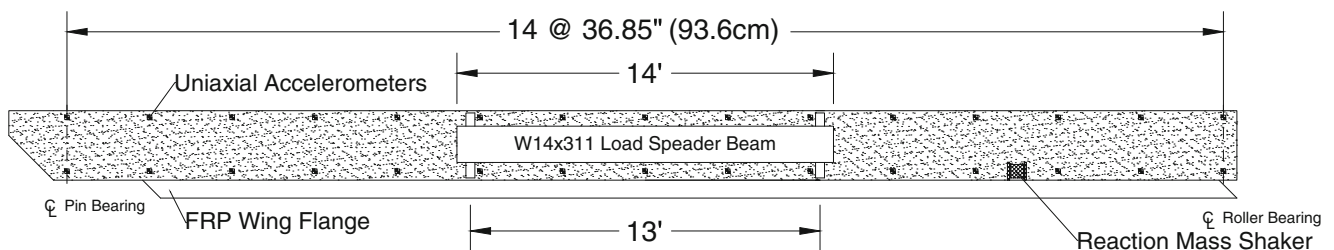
Plan view of instrumentation layout on surface of deck
